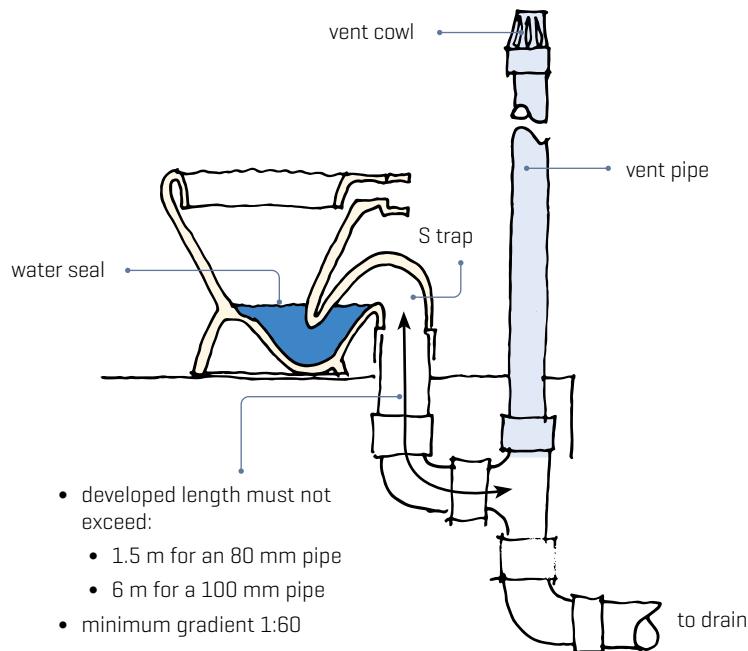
S trap soil fixture connected to drain and using the drain vent as a fixture vent.
